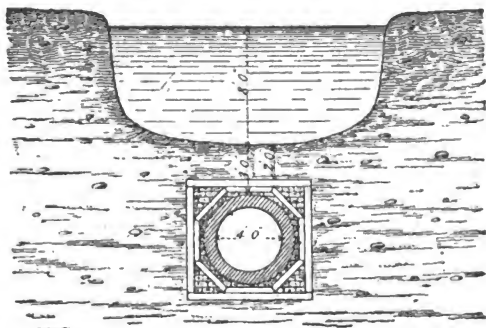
Sewer in tunnel under Regent's Canal, Caledonian Road.
